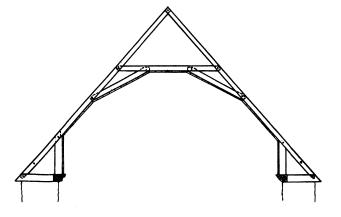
East Mersea, St Edmund, typical chancel roof truss, looking west.
